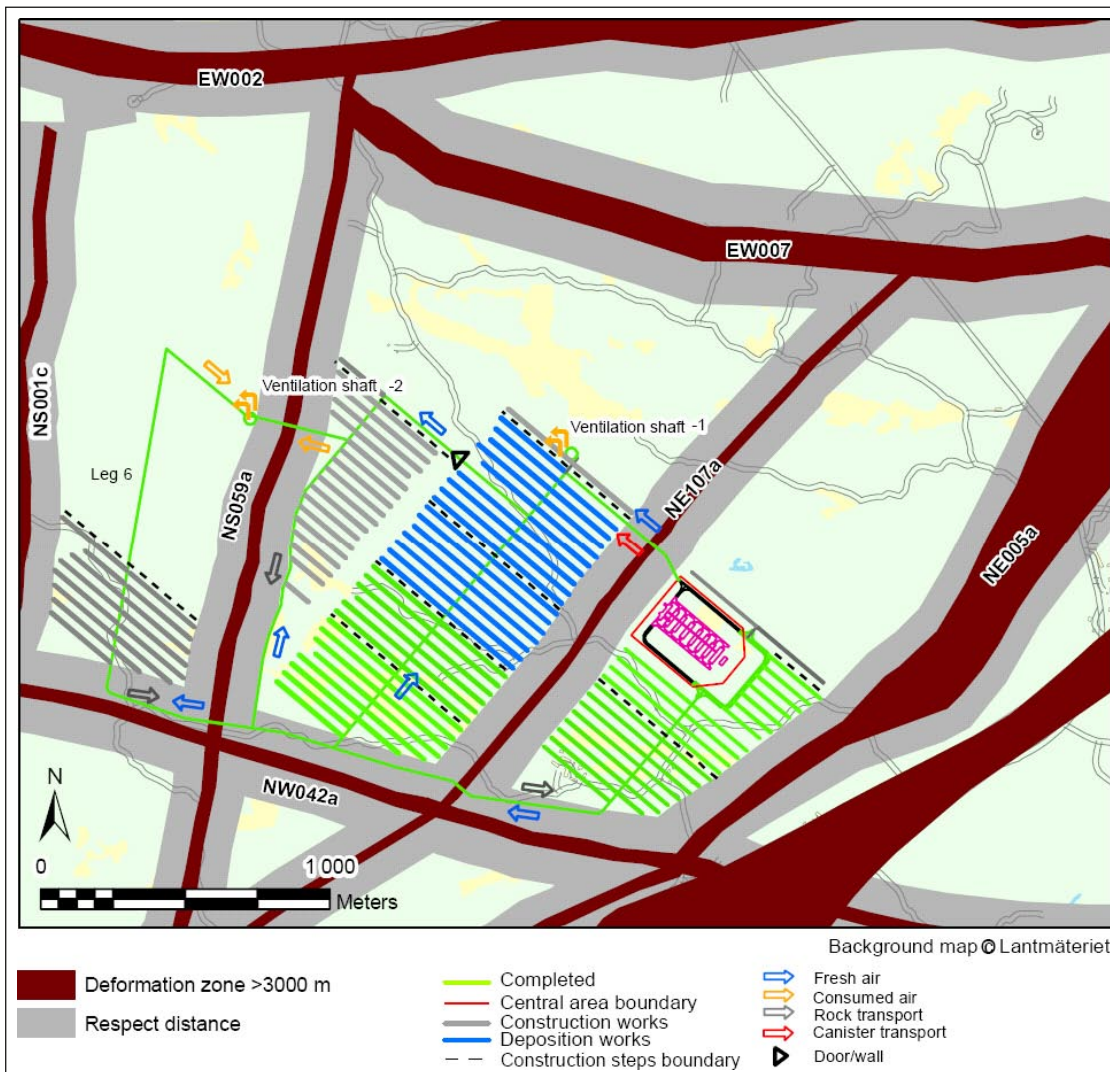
Excavation in leg 6 and 8 and in construction steps 7 and 8 and deposition works in construction step 5 and 6.
